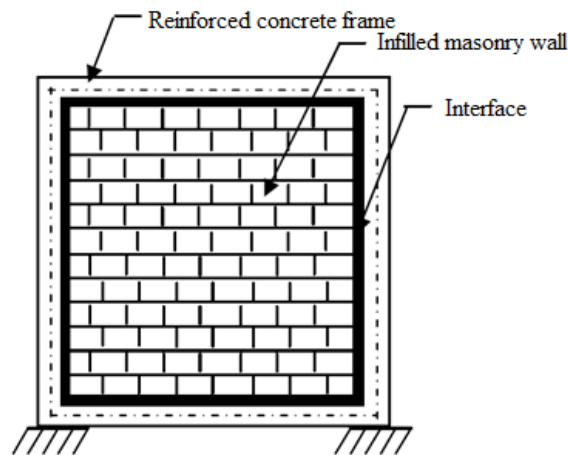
Conventional masonry infilled reinforced concrete frame with interface
